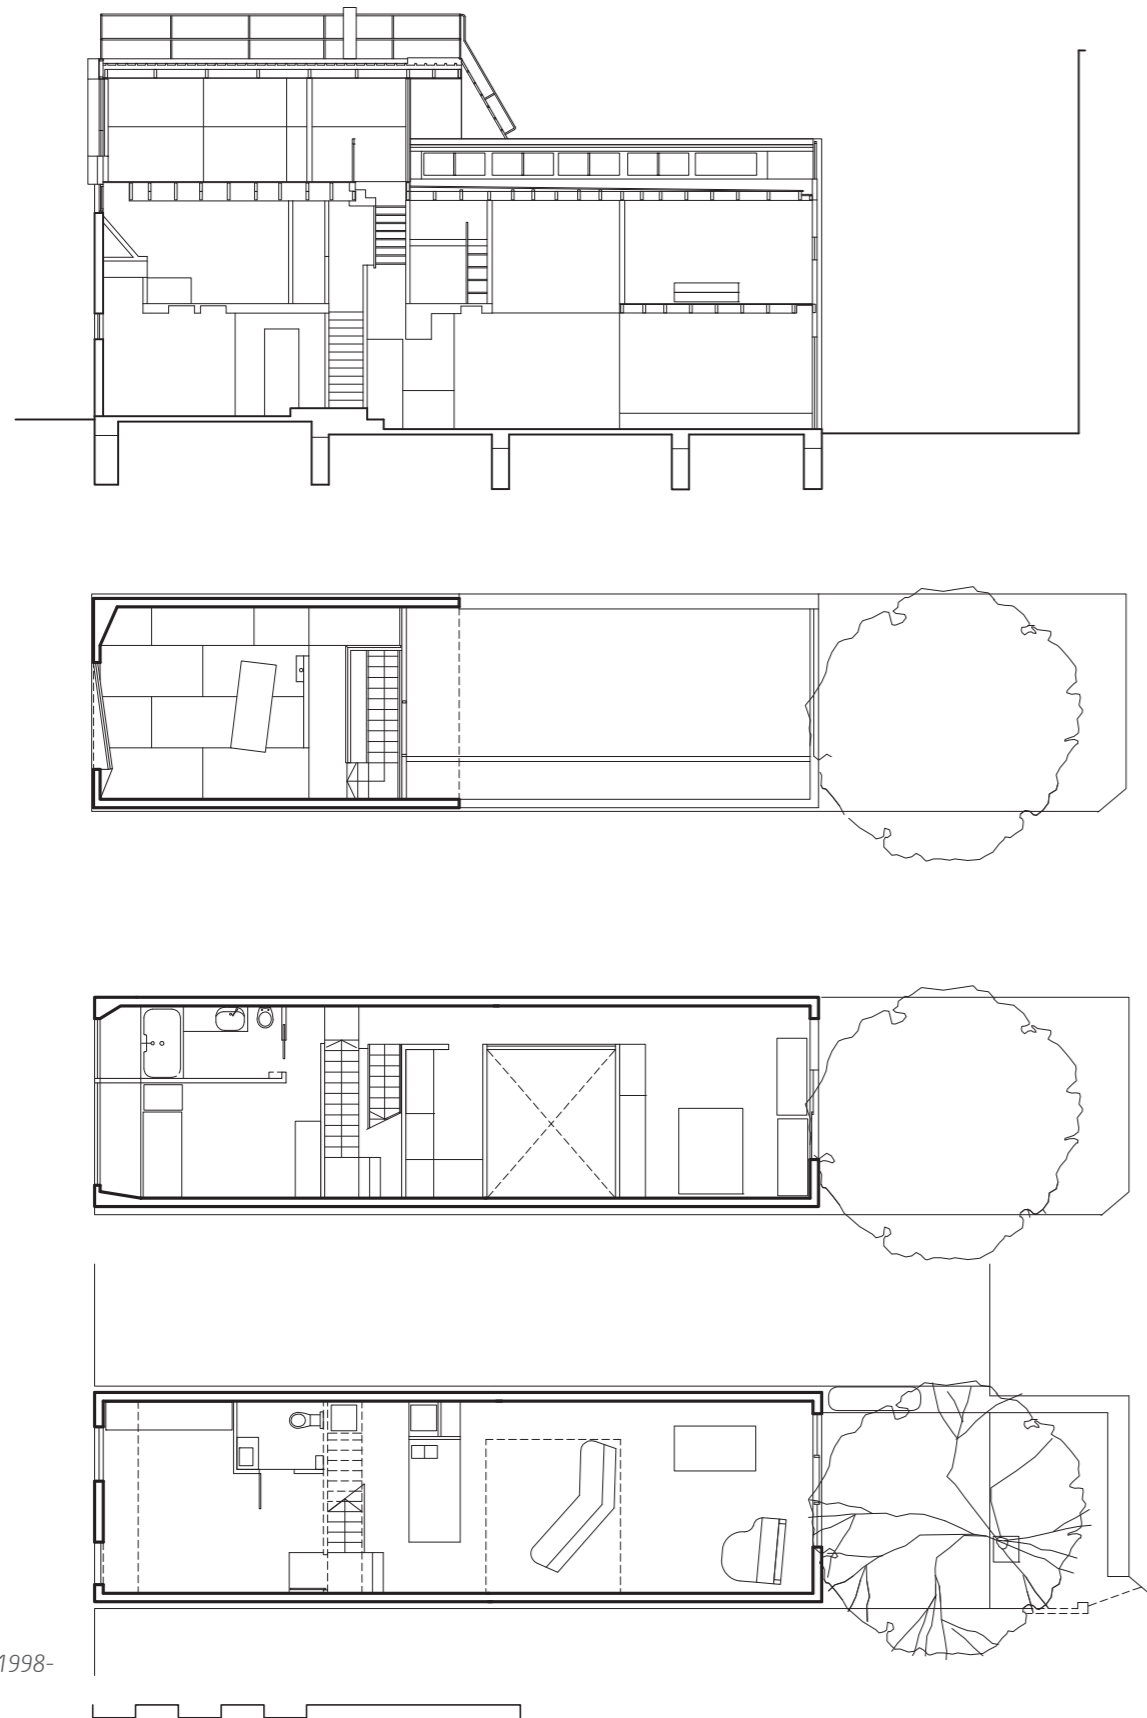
Caretaker House Melbourne 1998-2008. Section & Floor Plans
